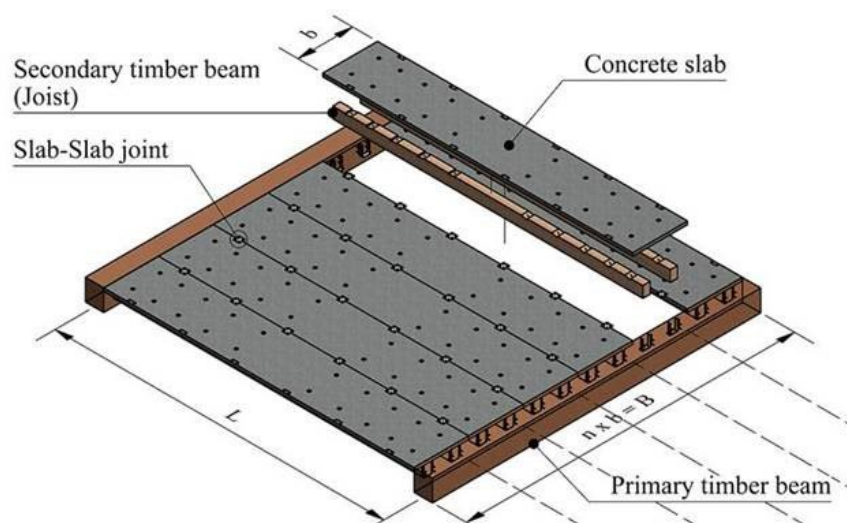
Conceptual design of the novel demountable timber–concrete composite floor system.
